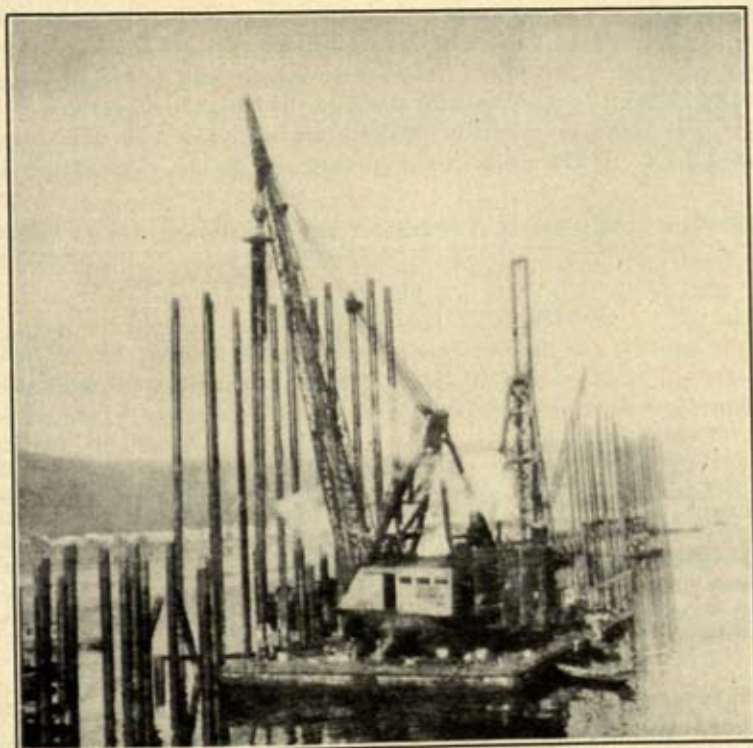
Barge-mounted rig driving 24-in. pipe piles up to 220 ft long. (*Construction Methods and Equipment*.)
